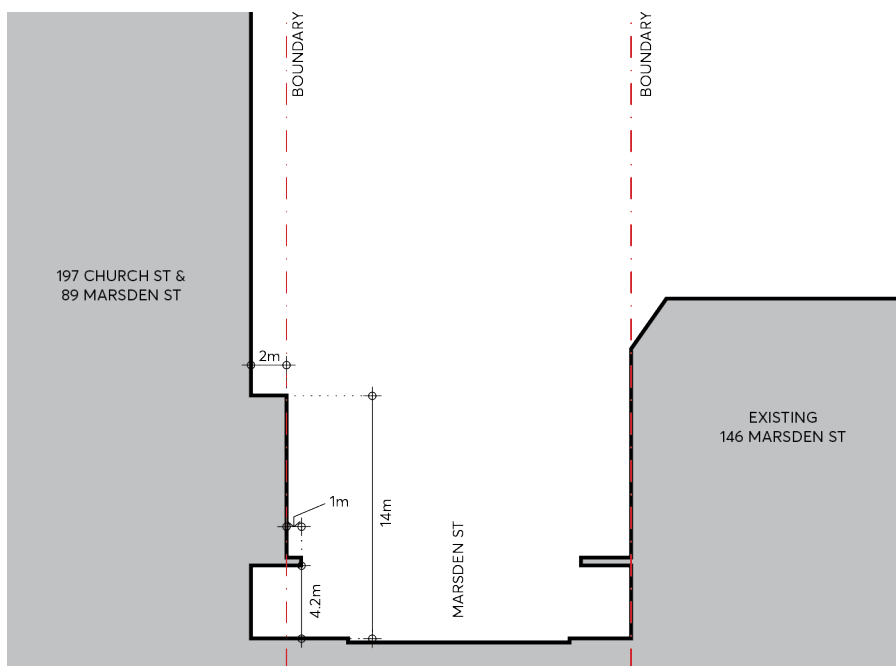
Marsden Street Frontage – Setbacks to Podium and Tower
